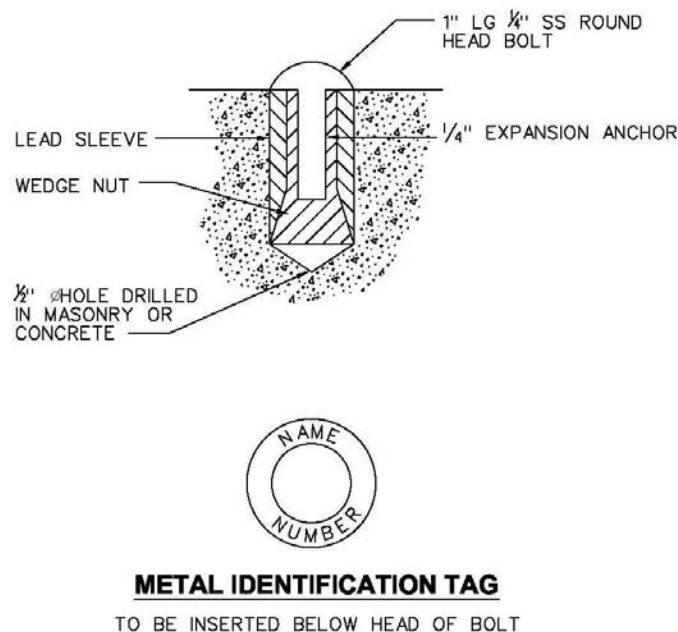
Deformation Monitoring Point in Masonry or Concrete Slab
